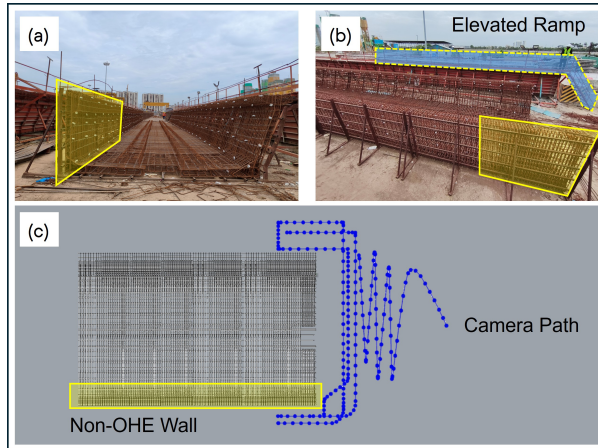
(a) U-girder reinforcement cage, (b) back-end isometric view highlighting elevated ramps, (c) schematic of the camera path used for site validation.
